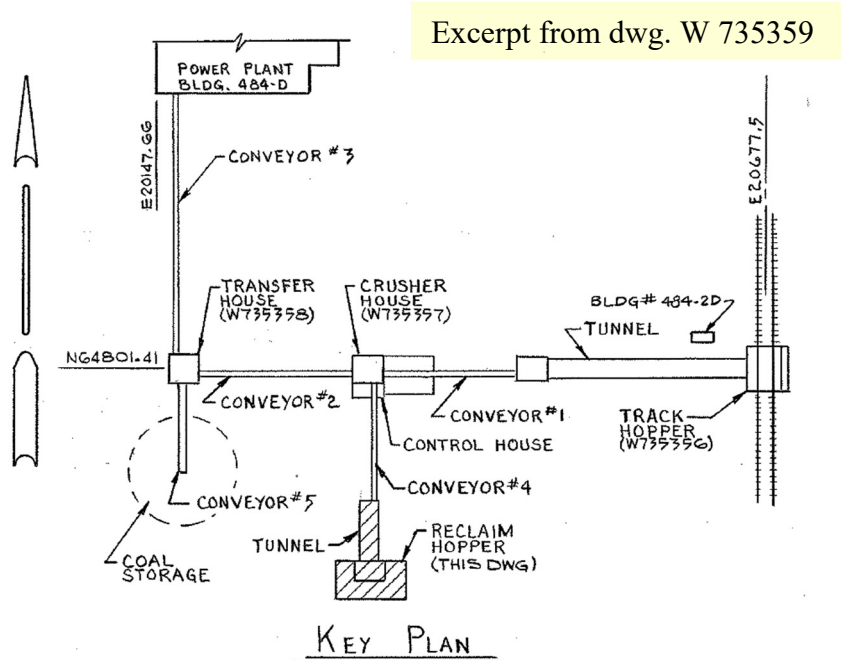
Overview of Crusher House, Conveyor No. 4, Tunnel and Reclaim Hopper
